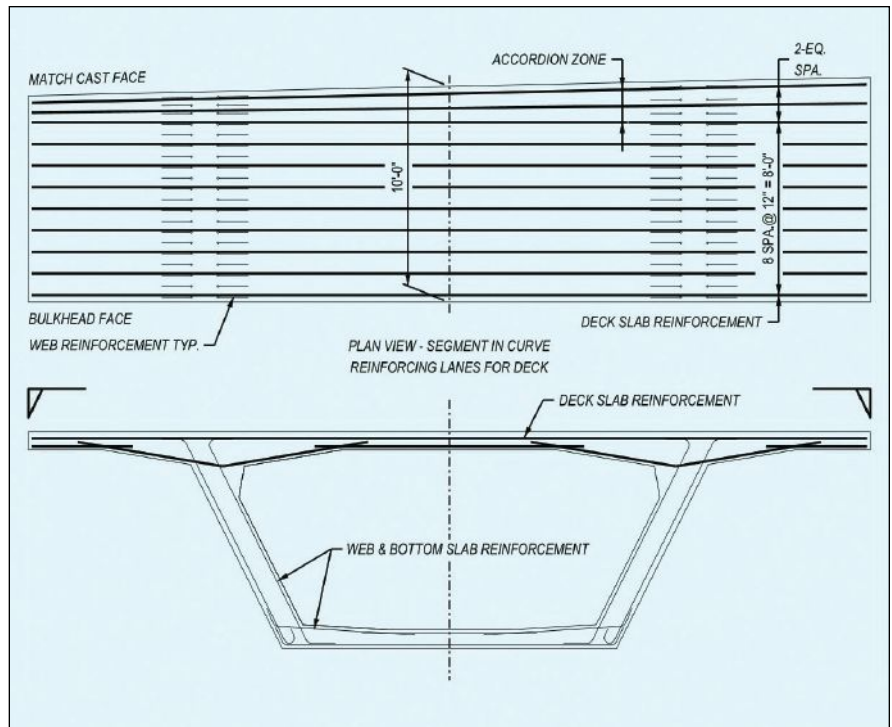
Adopt a reinforcement layout early in the design, and create dedicated lanes of reinforcing bars with spacings of common multiples. When segments have a skewed face, space the bars parallel to the bulkhead (the square end) from the bulkhead to beyond the anchor block reinforcement or other details requiring integration. Then, vary the spacing in an accordion fashion for a limited length near the skewed face. Web and bottom slab reinforcement would be placed using the same approach. Figure: McNary Bergeron & Associates.
